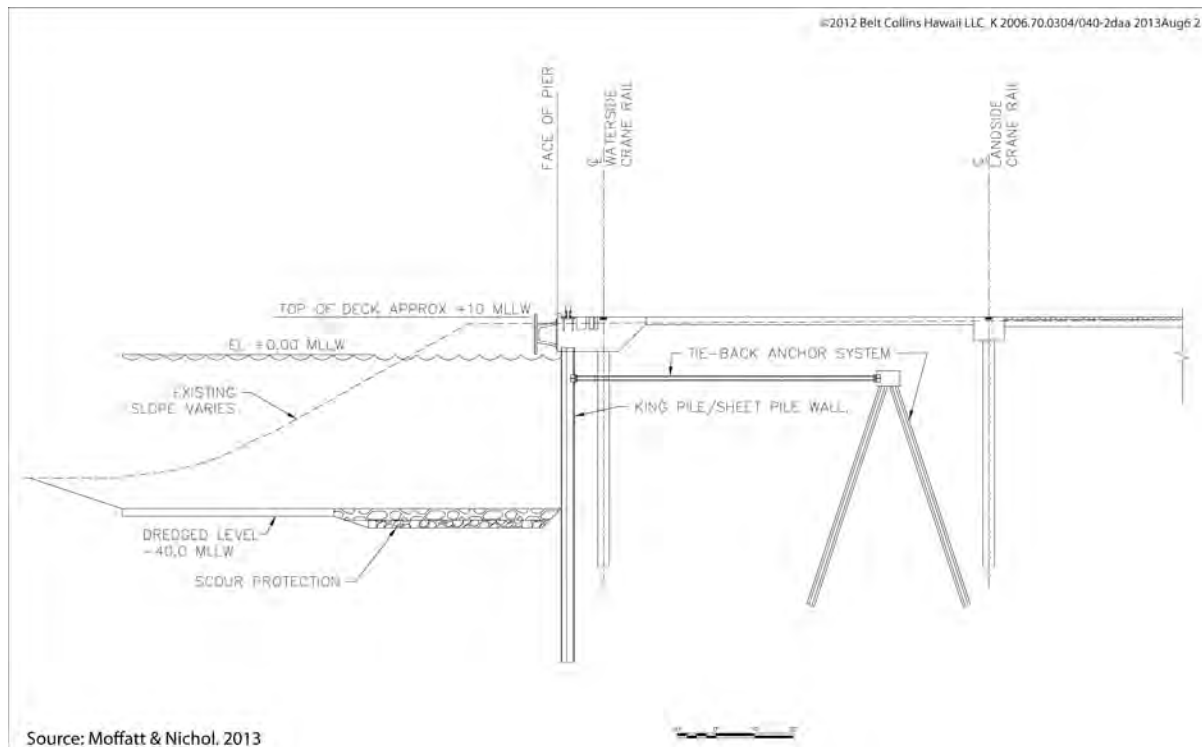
Typical Wharf (Bulkhead System) For Kapālama Container Terminal Section
